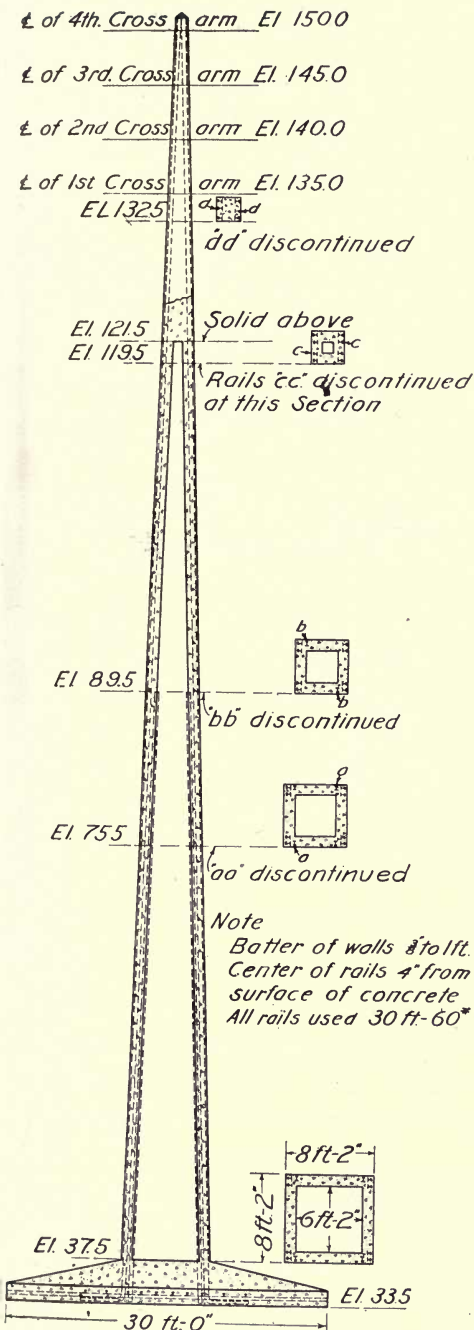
DETAILS OF CONSTRUCTION, BROWNSVILLE TRANSMISSION TOWERS.
